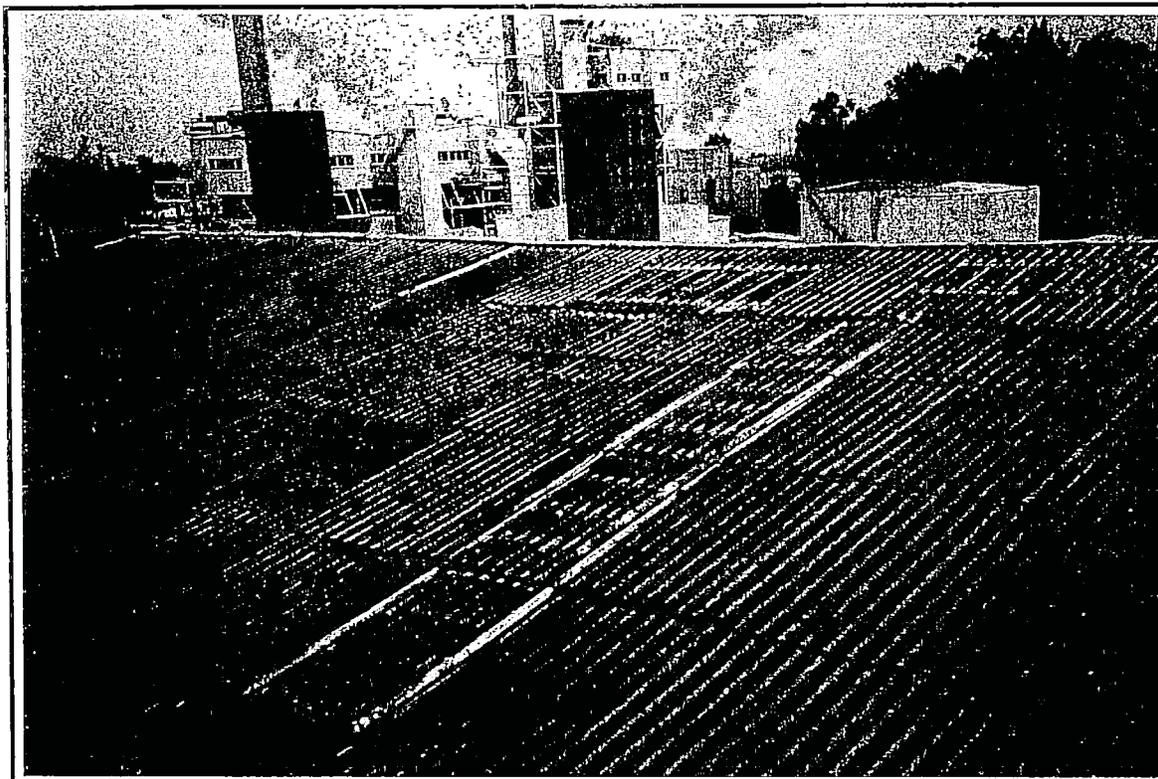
MACHINE SHOP (HIGH BAY) ROOF.
